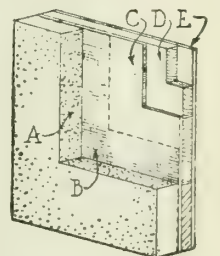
SECTIONAL VIEW "MILLER" STRIP
